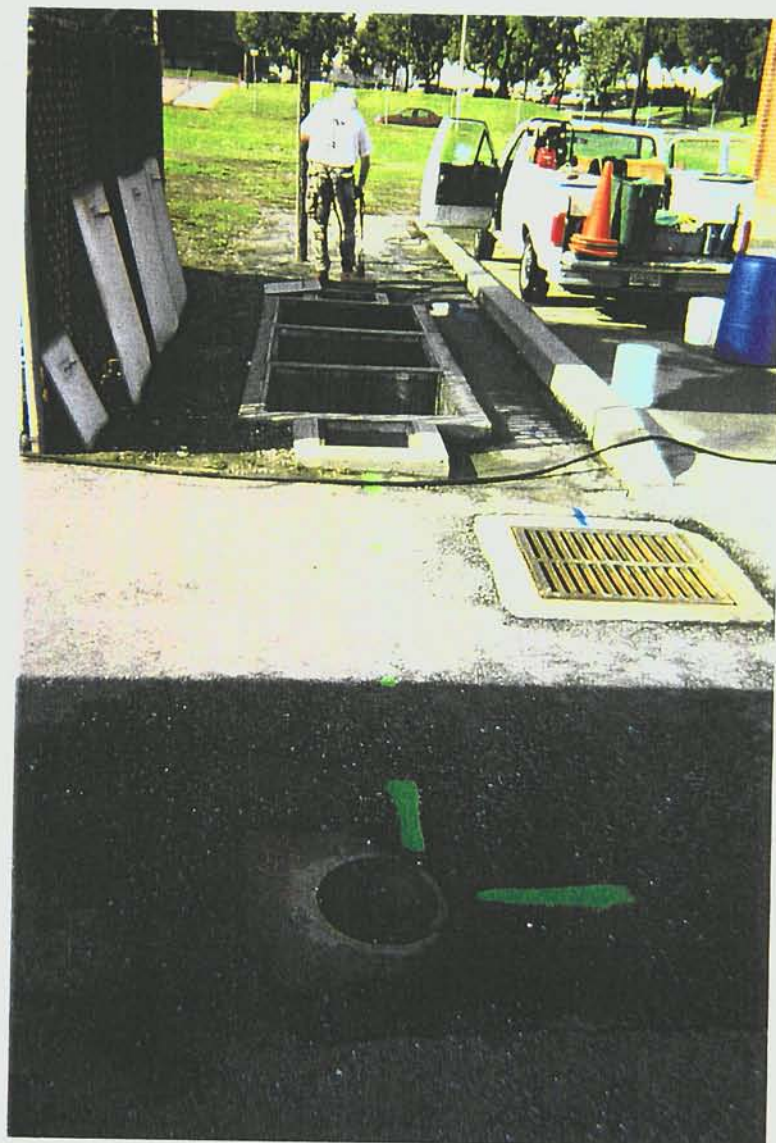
EXISTING OIL/WATER SEPARATOR, STORM DRAIN CATCH BASIN, AND SANITARY SEWER CLEAN OUT
